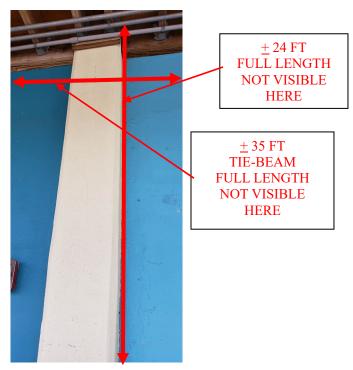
Location 14: Approximately 24 ft long new 12x12 concrete column. See detail 2/S102. Approximately 35 ft long new tie-beam. See detail 4/S103.
